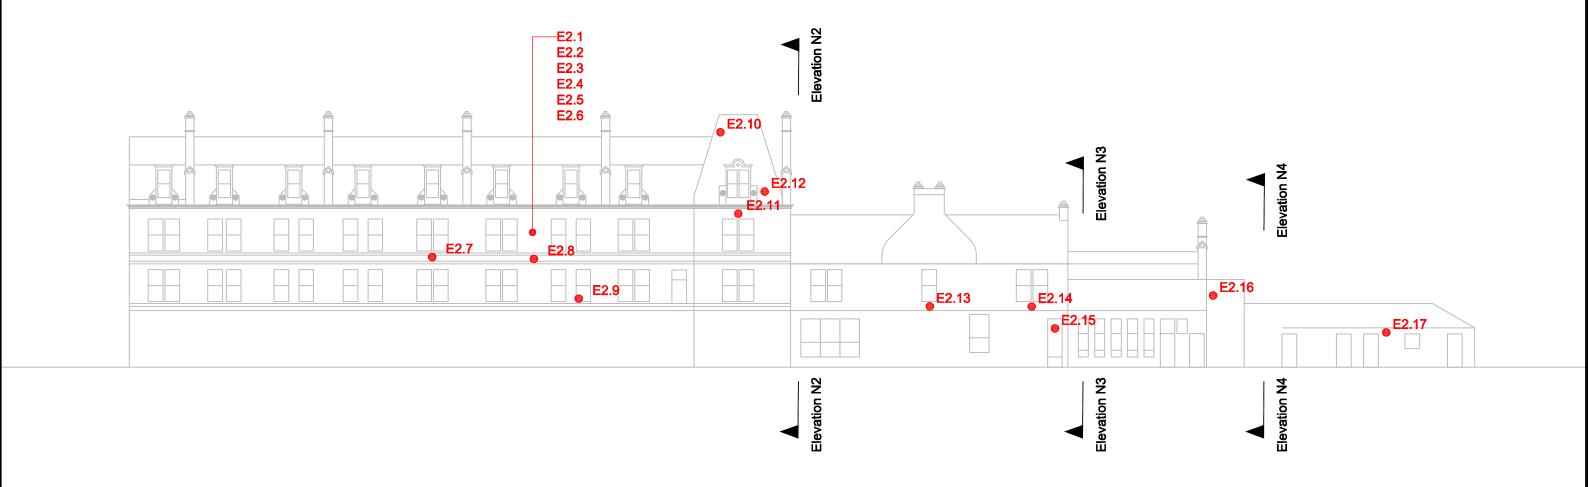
Elevation E2 of Station Hotel Building showing Defect/Observation Locations
